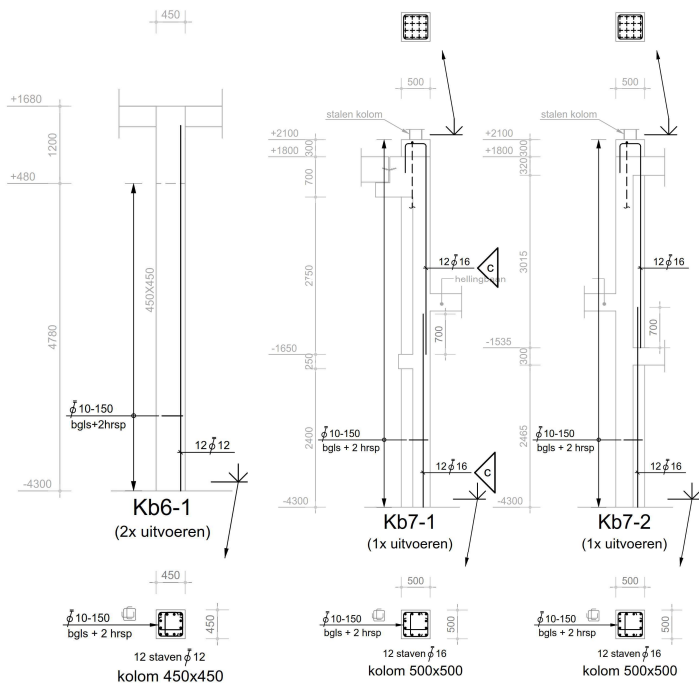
Column type Kb6-1, Kb7-1 and Kb7-2
